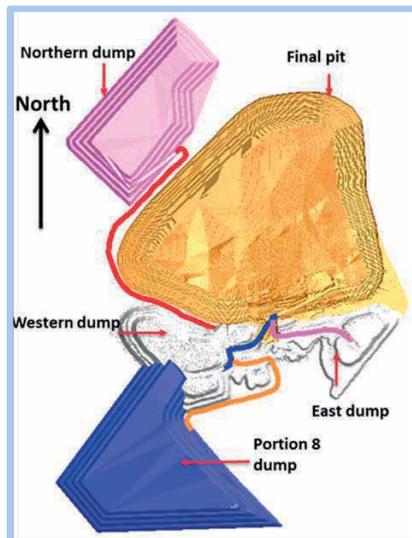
Haul Road Layouts (Source: VBKOM, schematic, not to scale)
